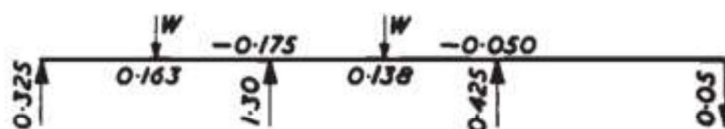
Adjacent Bay 600mm Spacing Load Configuration
